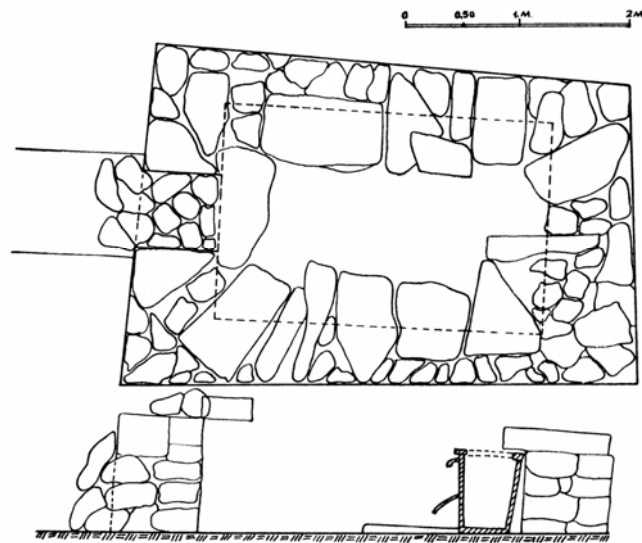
Plan and section of Praisos Photoula tholos (Platon 1960a, 304, fig. 1)
